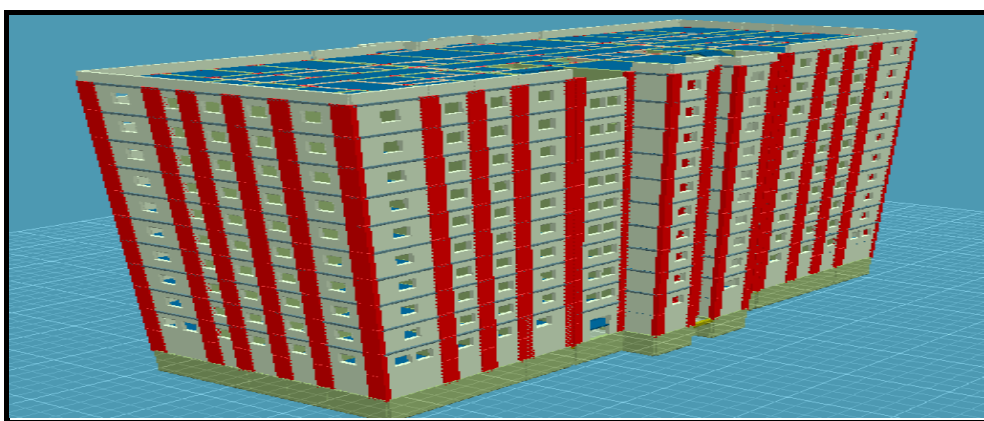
The 3D View of Buildings with Ten Stories and Tunnel Formwork
